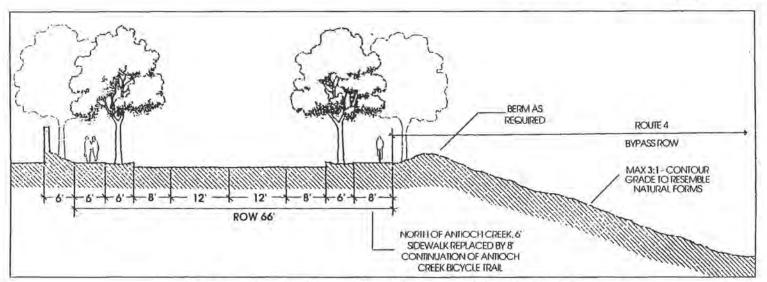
Typical section, Country Hills Drive (section north of Antioch Creek and south of community retail).
